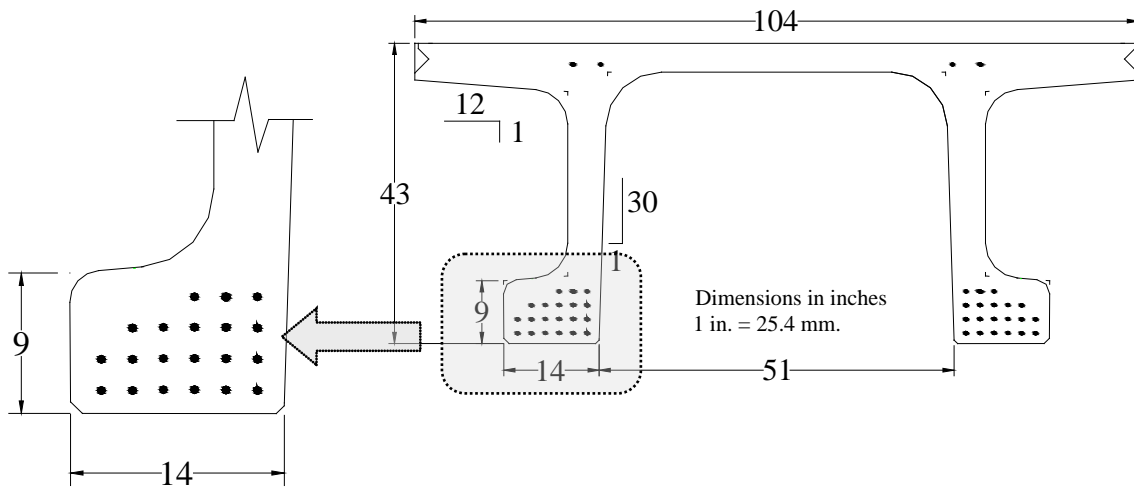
Illustration. Strand Layout of Section III for 105-foot (32.0-m) Span
